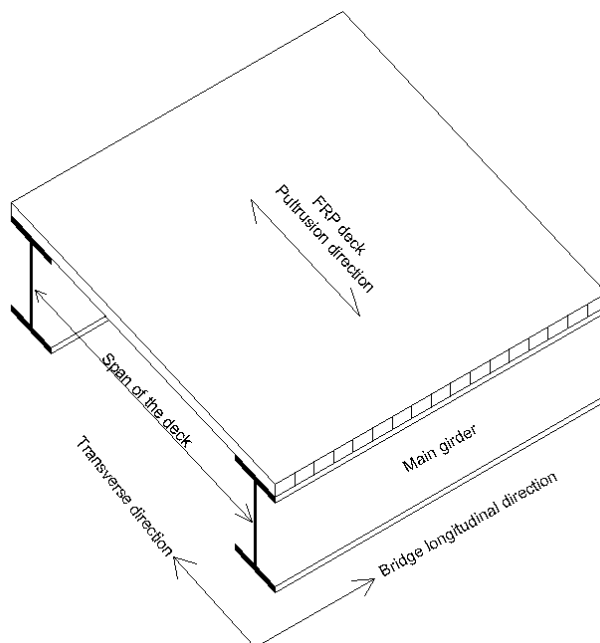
A simple sketch of FRP deck on steel girders. The deck is oriented with the pultrusion direction perpendicular to the main girders
